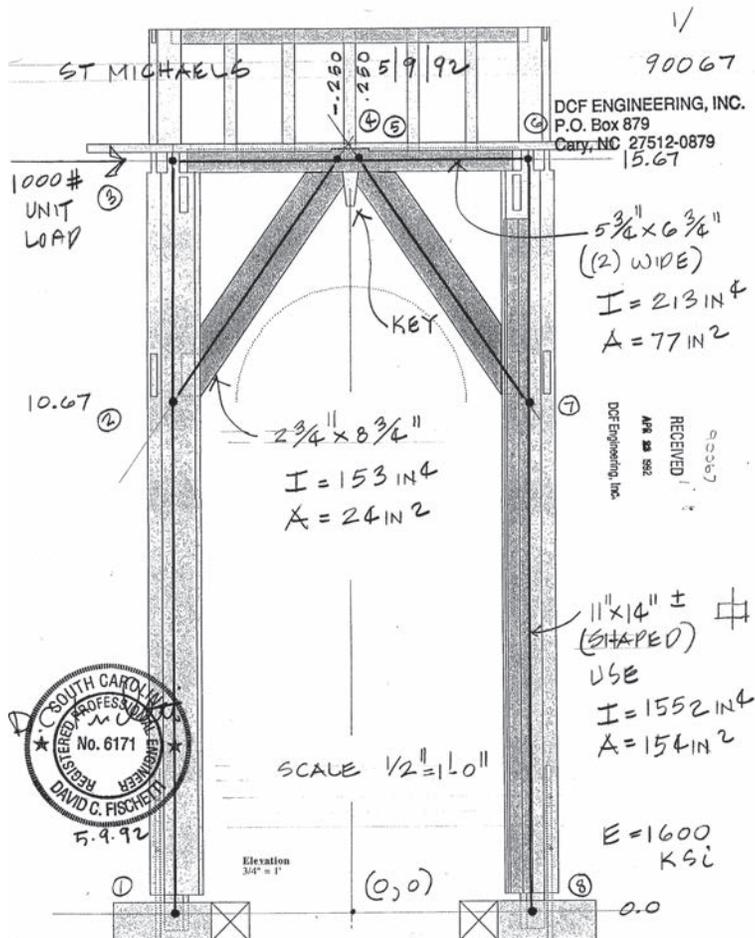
Portal framing behind finish. Wedge descends through beam.
